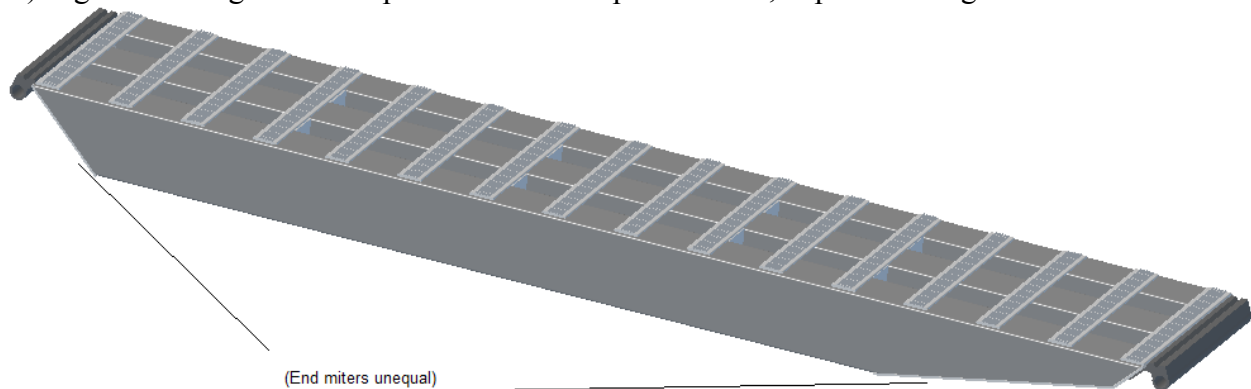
Illustrated view of a Single 8 ft Lower Ramp Section
